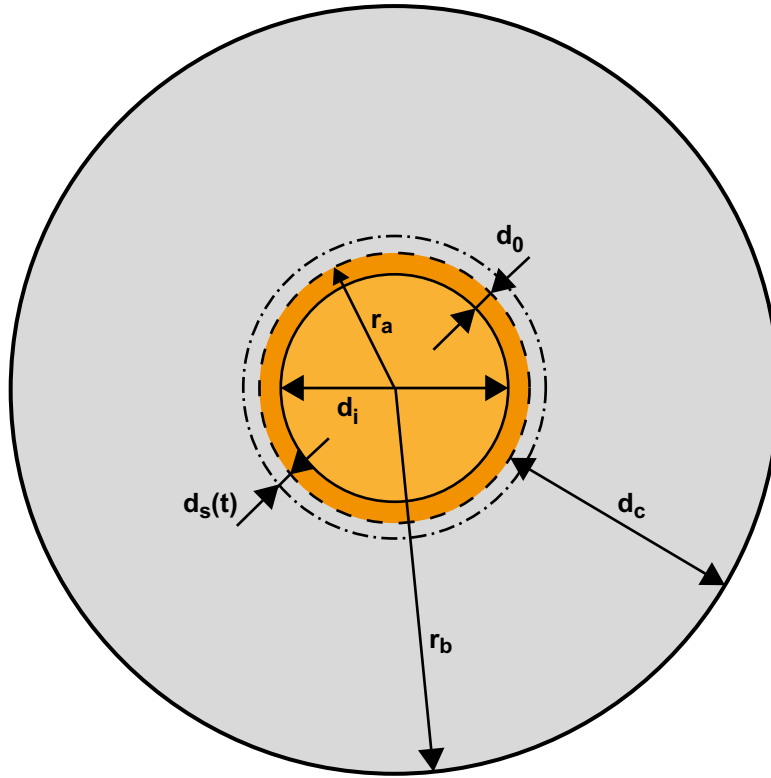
Illustration of corrosion of reinforcement bars causing fracture formation in concrete constructions.
